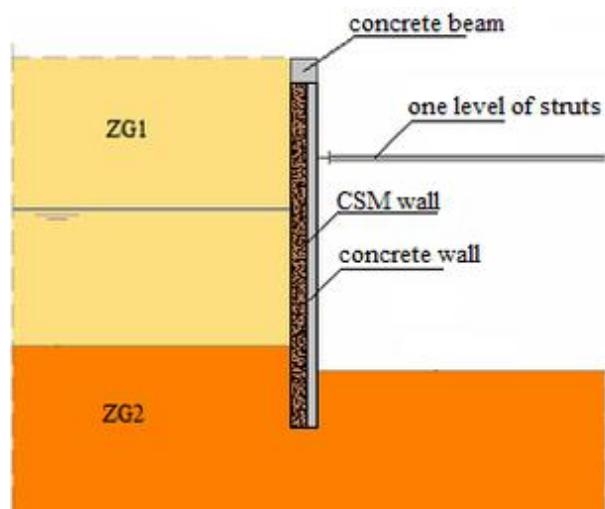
Cross-section of the retaining wall of the "Villa Paradisio" project.
